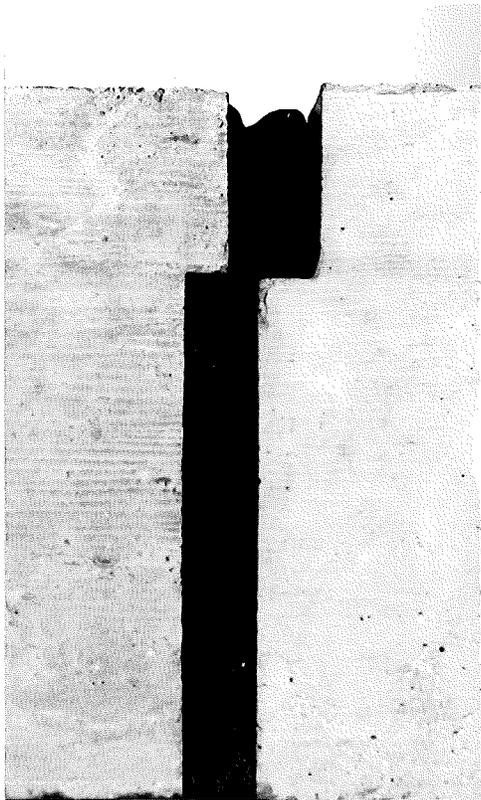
(left). Joint sample before testing. Concrete overhanging the filler by 1/2 in.
